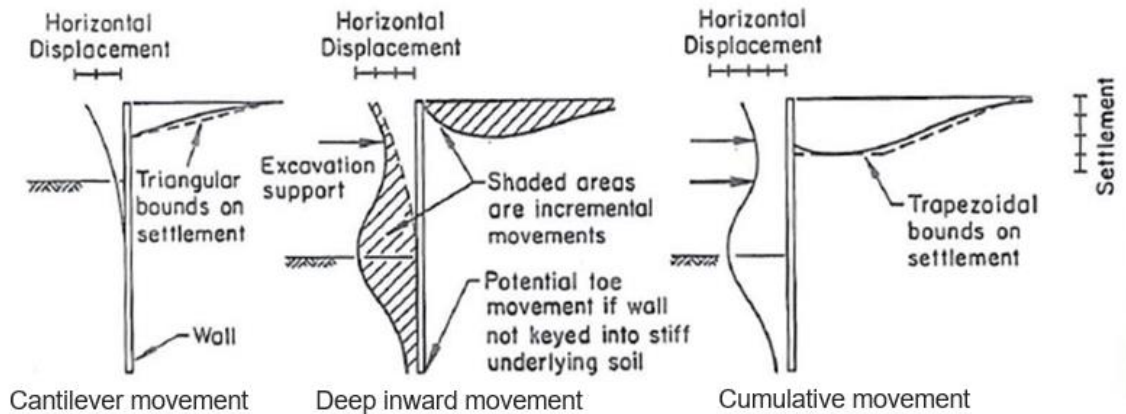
Typical deformation profiles for excavations (Clough and O'Rourke, 1990).
